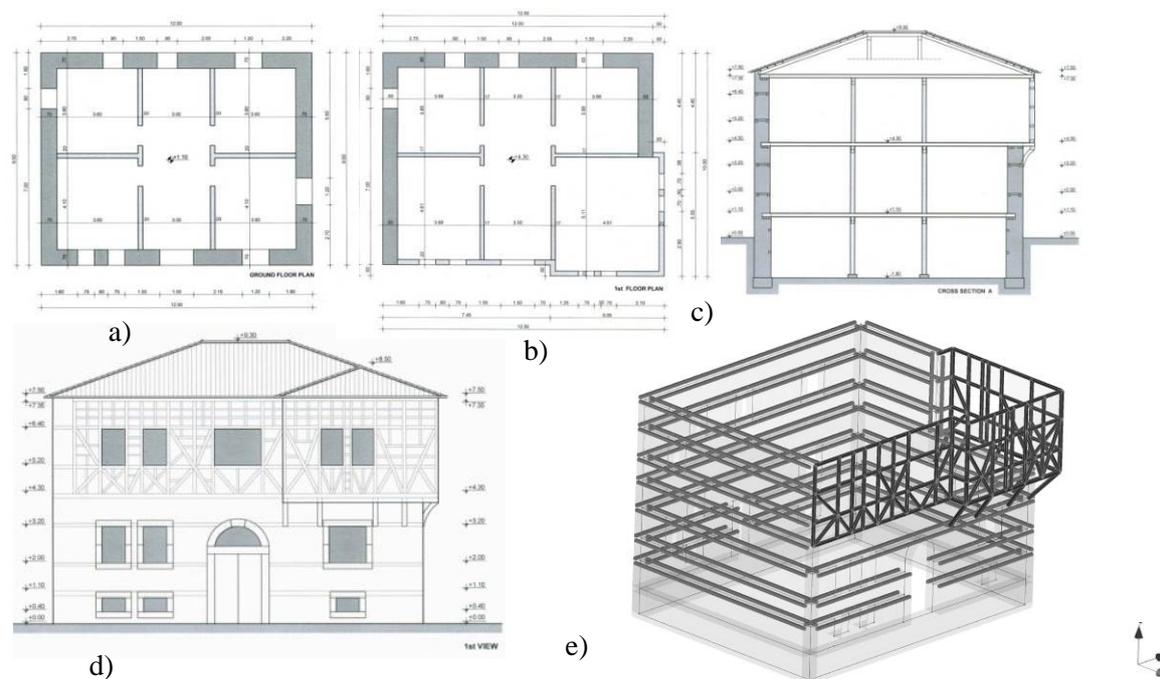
Representative sample building from the historical city core of Xanthi. (a) Plan view of first floor, (b) Plan view of upper floor, (c) Building cross section, (d) Front view, (e) Arrangement of timber laces
